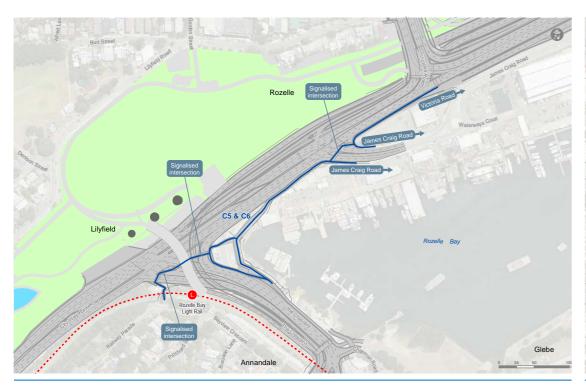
ATN Connections - C5 - Victoria Road - Iron Cove Link
